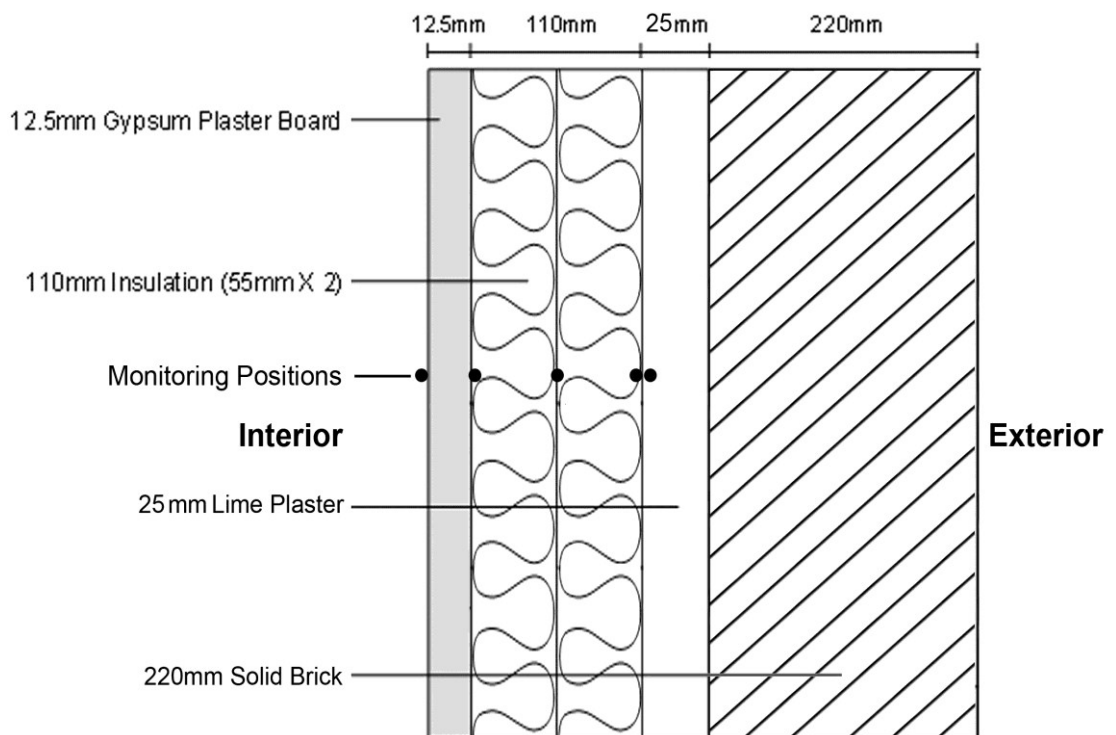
The vertical cross section of the solid brick wall assembly (with lime plaster) without vapour barrier (wall-7).
